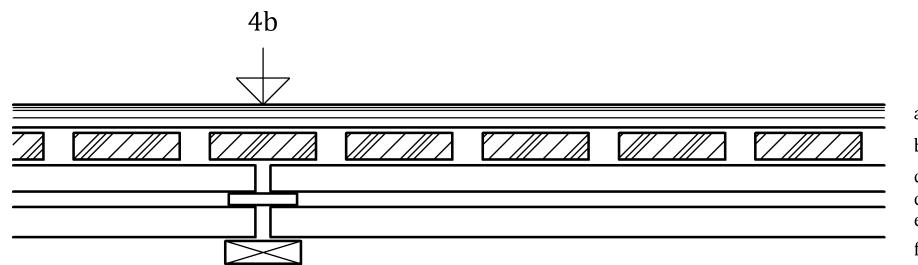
Area-elastic sports floor with elastic construction (beam, consisting of two parallel one upon another battens, support non-staggered)
